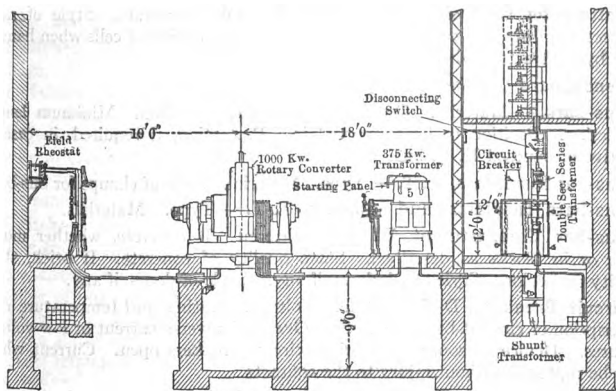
Arrangement of Switchgear Equipment in Rotary Converter Station
